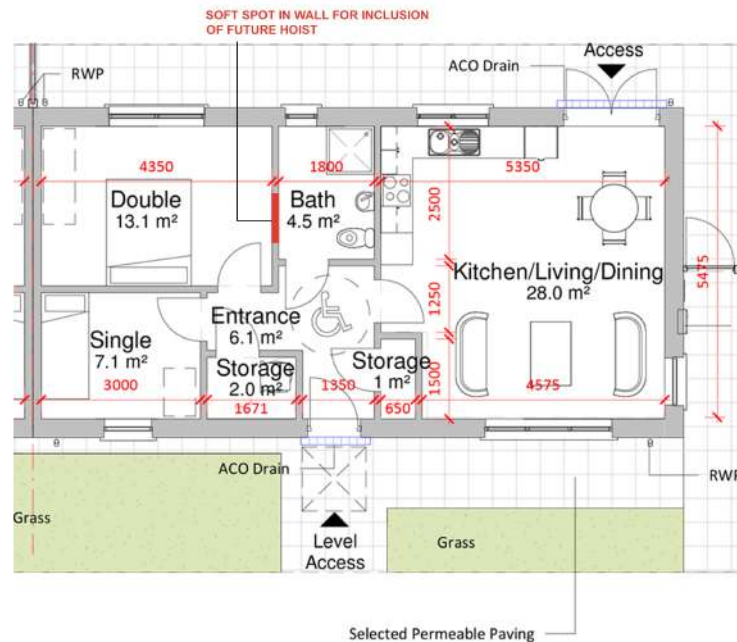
Single Storey Units showing inclusion for bathroom hoist
